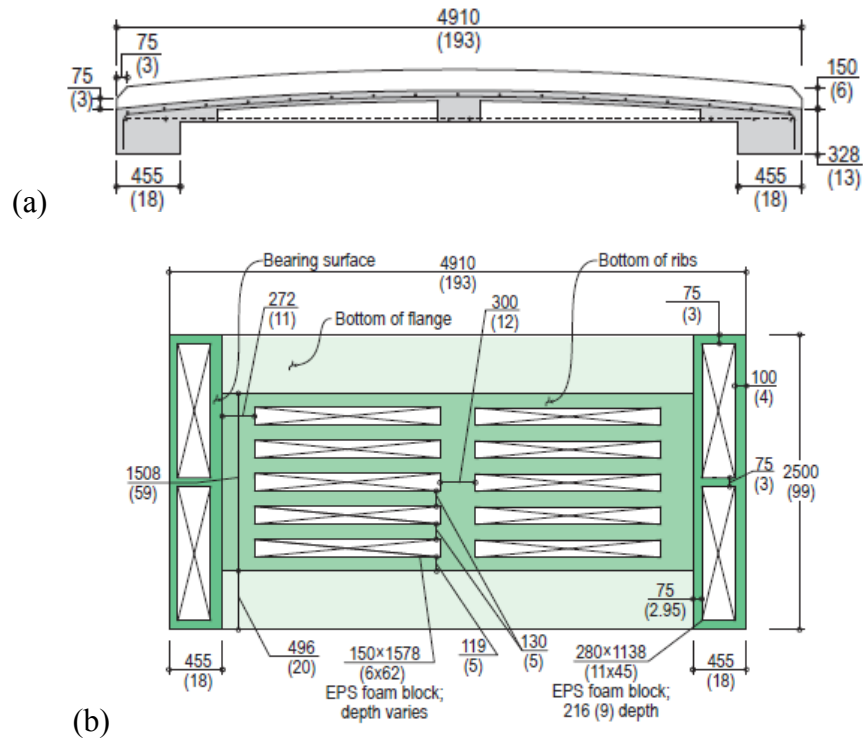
Bridge: (a) schematic longitudinal section at centerline, (b) bottom view showing concrete dimensions in mm (nearest in.)
